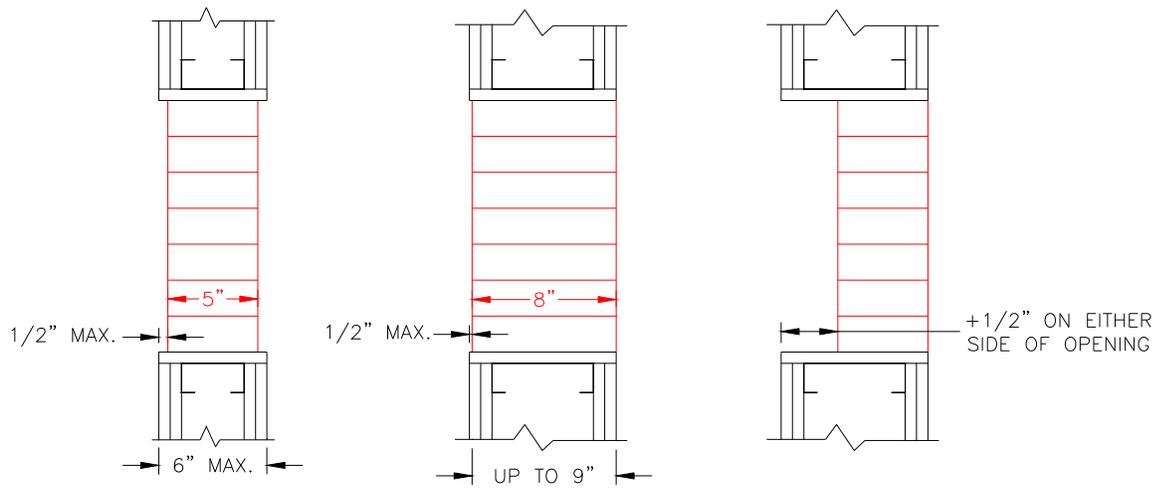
TYPICAL ORIENTATION OF HILTI FIRE BLOCKS AT VARIOUS WALL CONSTRUCTIONS
